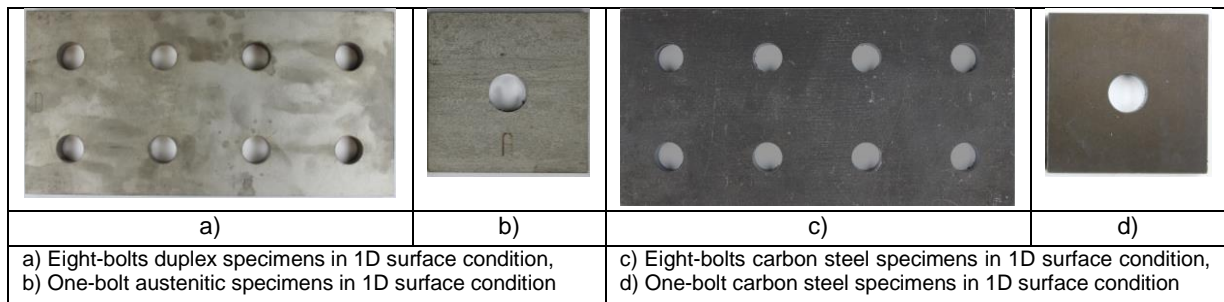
Exemplary photos for stainless steel and carbon steel test specimens
